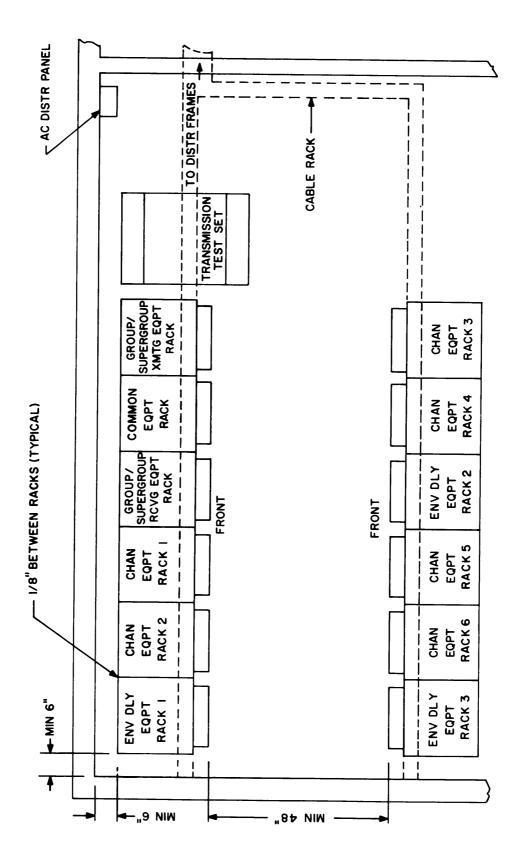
AN/UCC-4(V) Typical Floor Plan
